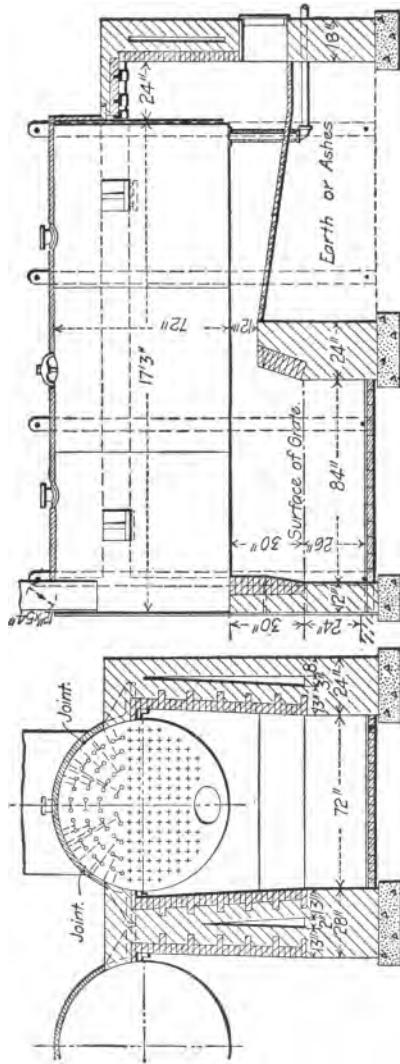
Typical Setting of Horizontal Return Tubular Boiler.
